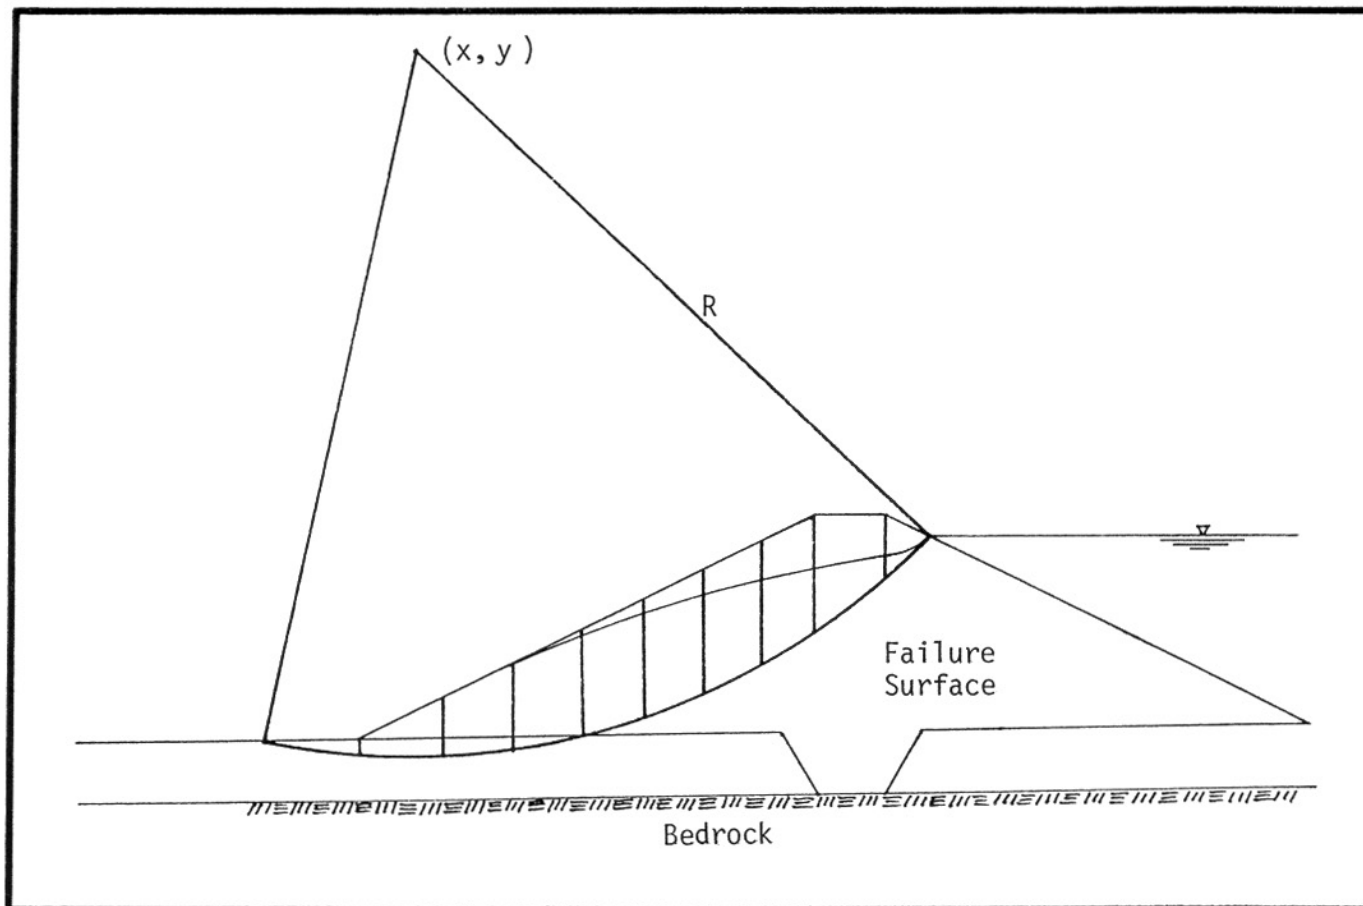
Circular Failure Surface in an Earthfill Dam
